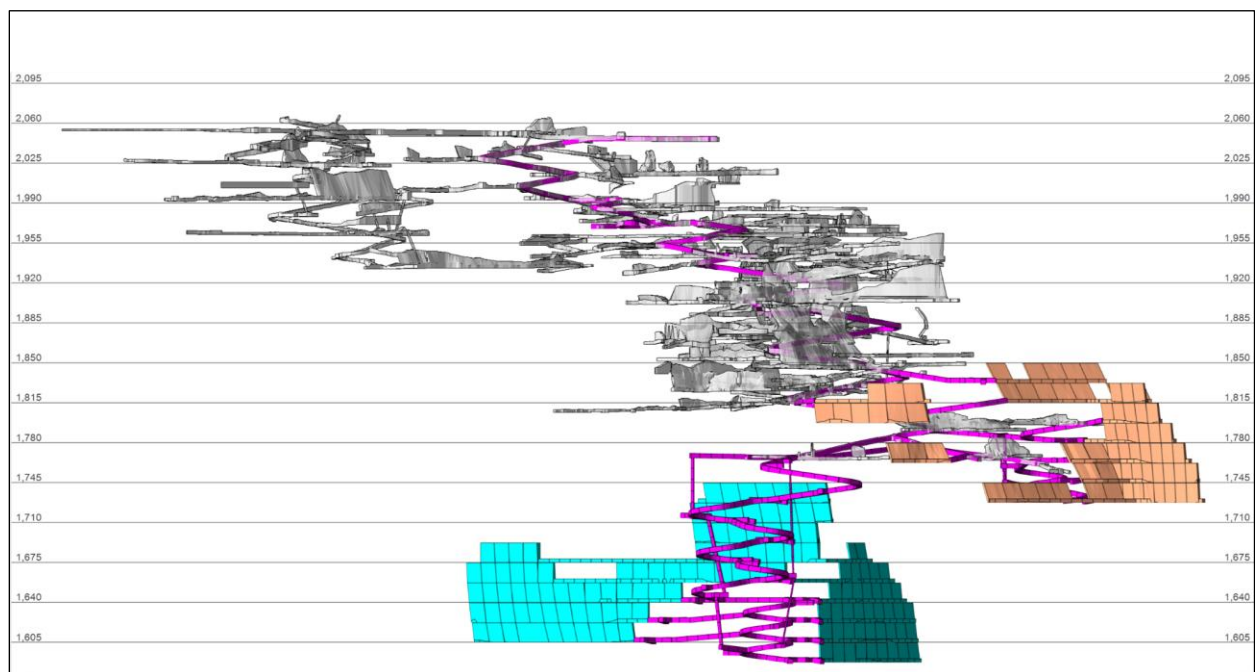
San Miguel End of Y1, Long Section Looking West
